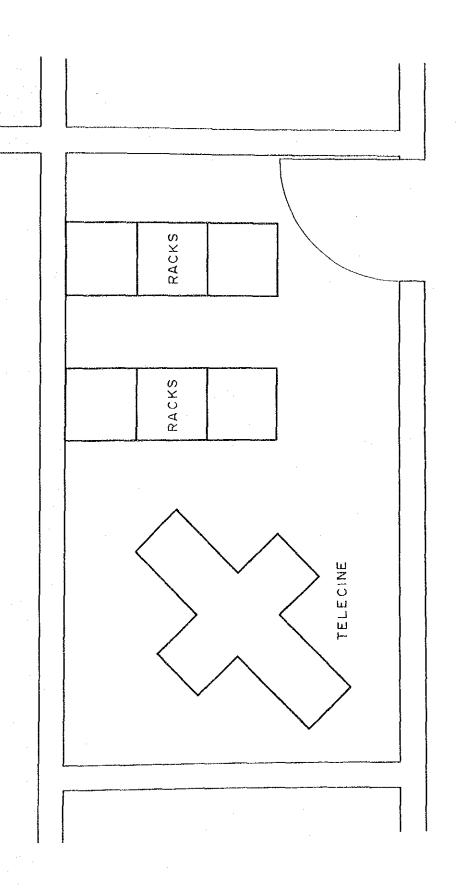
FLOOR LAYOUT OF MASTER CONTROL ROOM (1:30)
